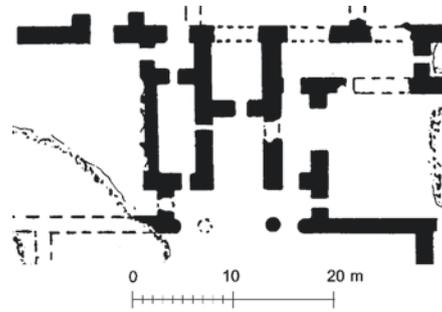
al-Kūfa, governor's residence (*dār al-imāra*), T-shaped hall at east side of courtyard, detail of ground plan (detail from fig. 8).
